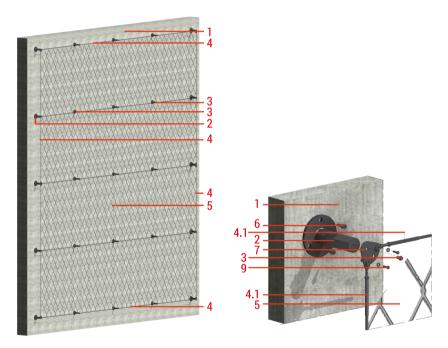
Axonometry and detail. Legend: 1. Load bearing layer; 2. AISI 316 stainless steel lateral spacer; 3. AISI 316 stainless steel central spacer; 4. AISI 316 braided steel support cable, circular section Ø4 mm; 4.1. AISI 316 braided steel cable; 4.2. AISI 316 stainless steel threaded sensor; 5. AISI 316 stainless steel braided metal mesh; 6. Screw for fastening spacers; 7. AISI 316 stainless steel fork (5 mm thick); 8. Hexagonal head screw for fastening the fork to the spacer; 9. Screw for fastening the support cable to the fork; 10. Single or crossed clamp in AISI 316 stainless steel; 11. Mechanical dowel for fixing central spacers (Source: own elaboration)
